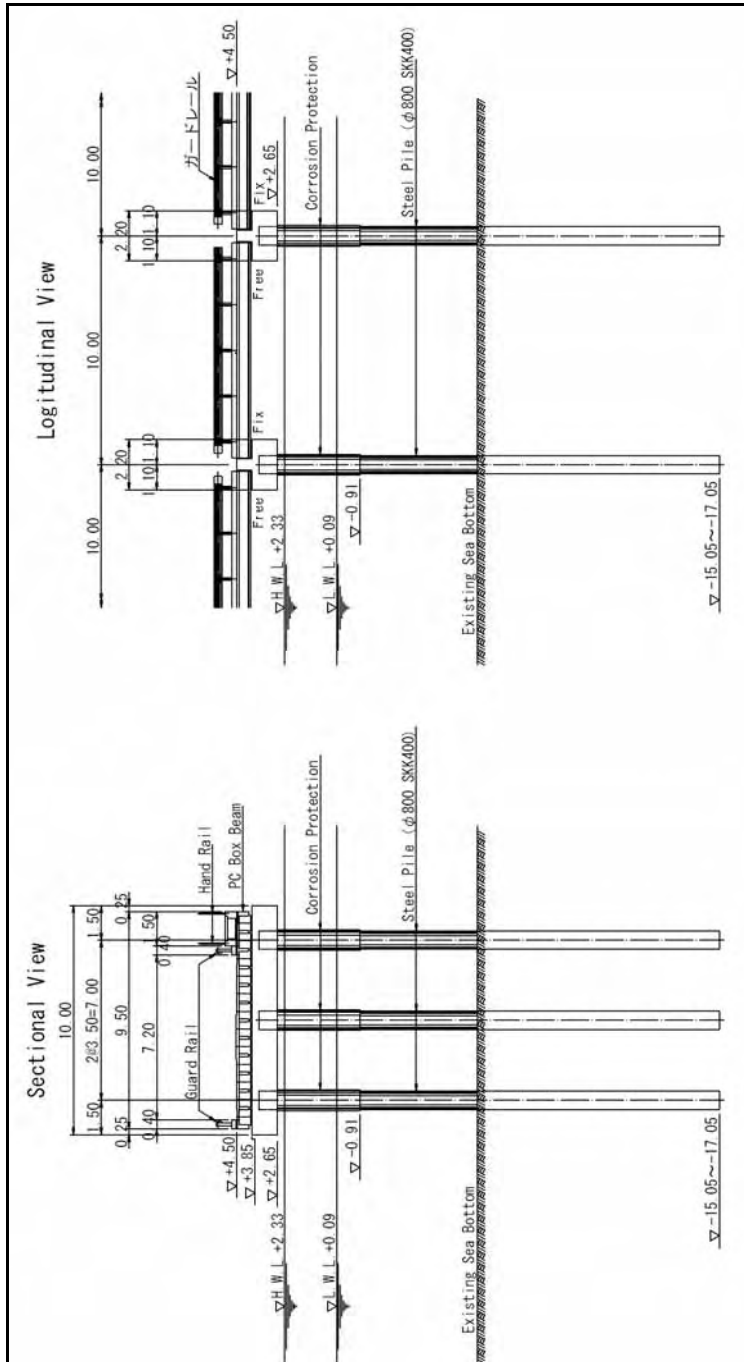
Cross and Longitudinal Section of Access Trestle
